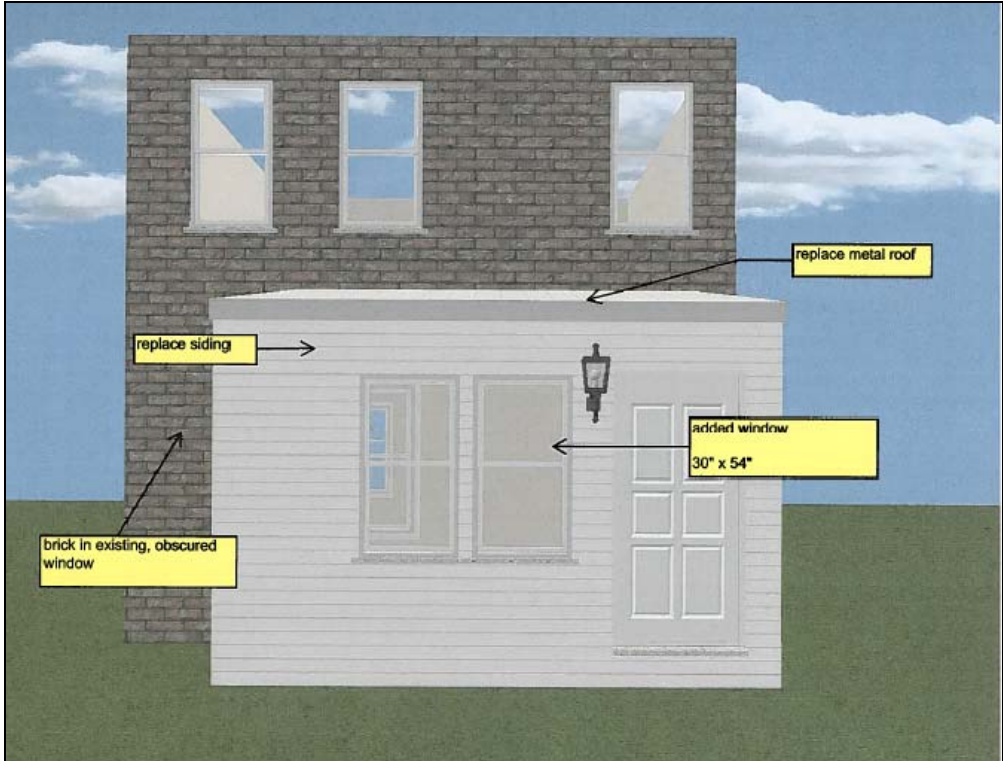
Proposed alterations on rear elevation: window to be bricked in and new opening to be created on one-story frame portion.
